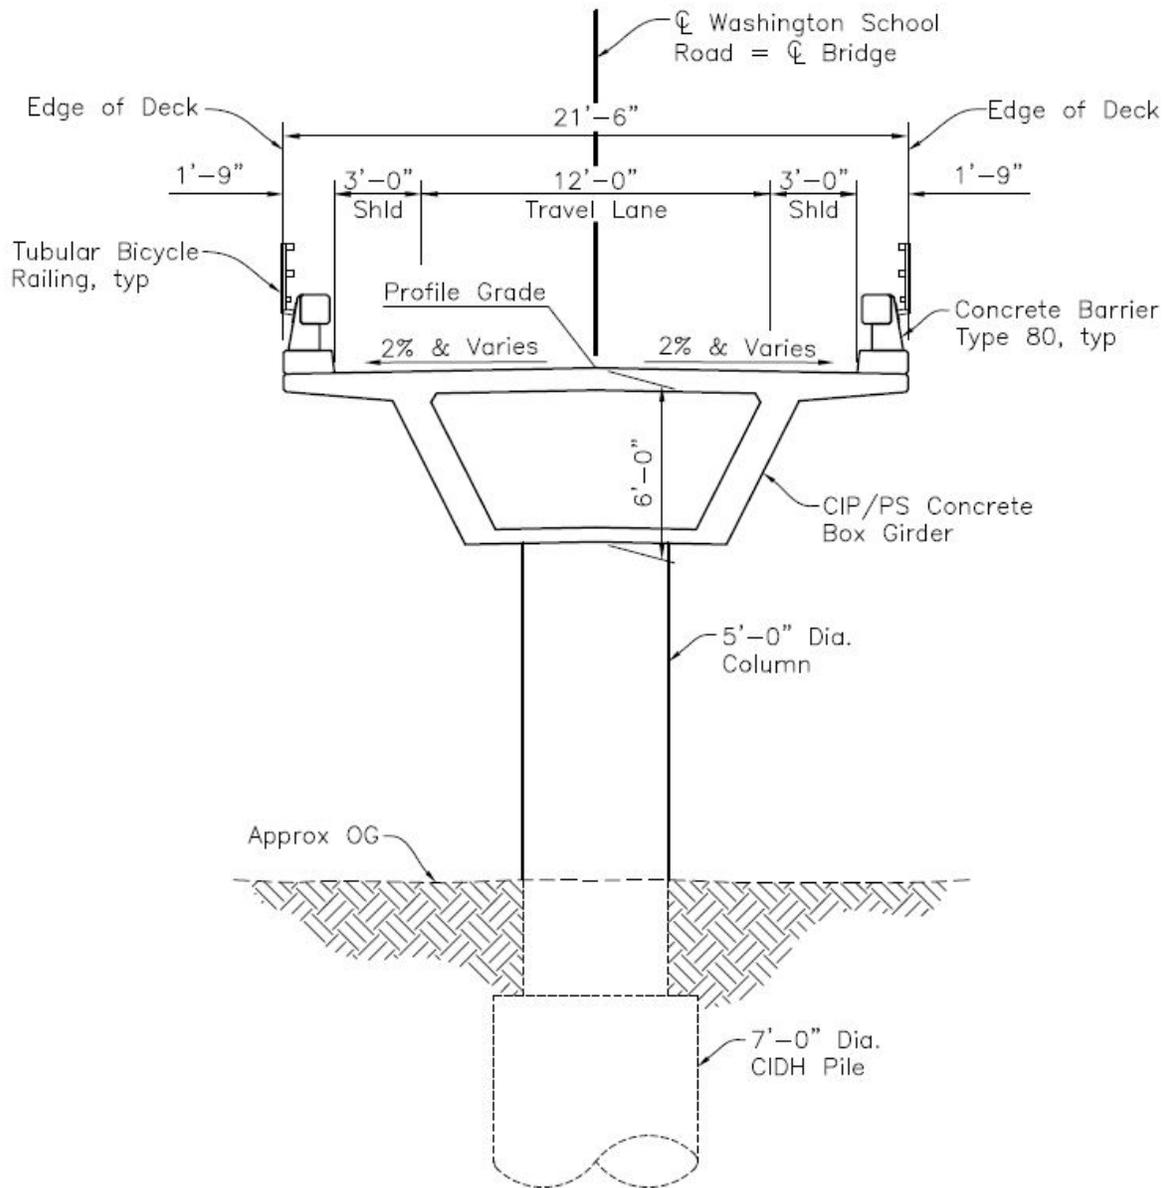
Single Lane CIP/PS Concrete Box Girder Typical Section
